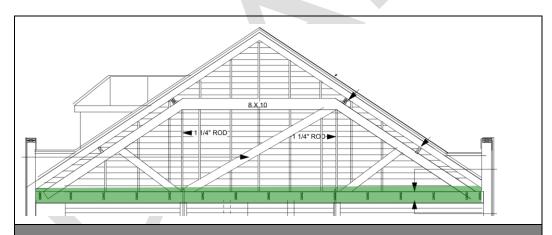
Example of an interior insulated roof approach, with the plane of the insulation shaded green on a partial section drawnig of the roof (drawing underlay source: Keay Architecture Ltd.).
